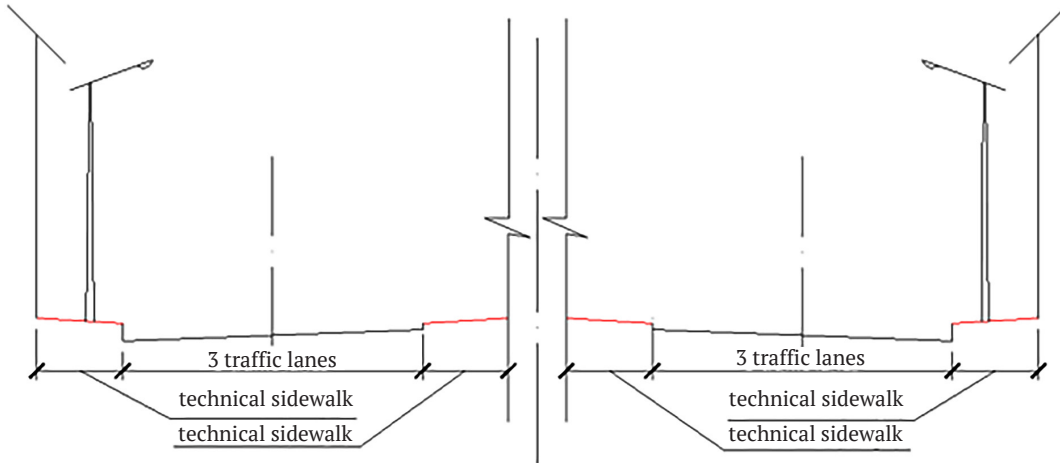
The cross-section of the road section of the Darnytskyi Road and Railroad Bridge in Kyiv
